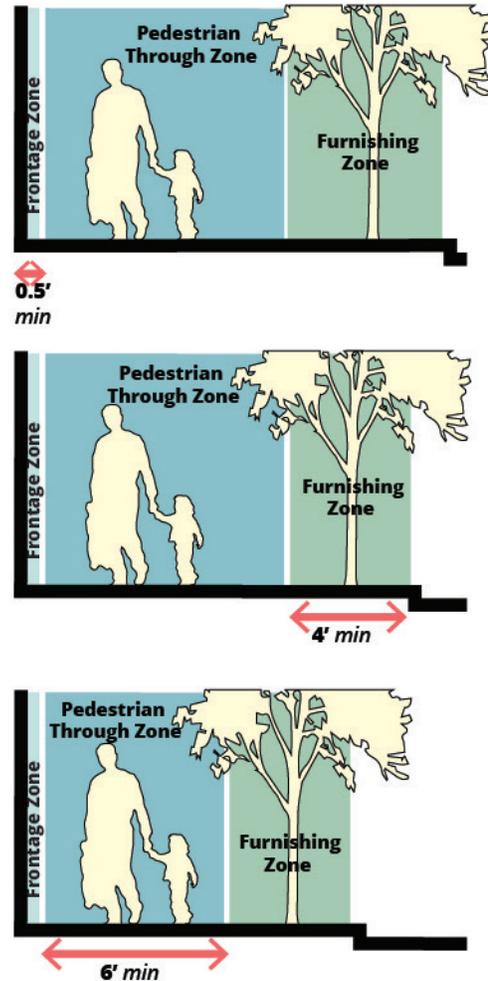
Process for allocating sidewalk corridor width in constrained conditions
